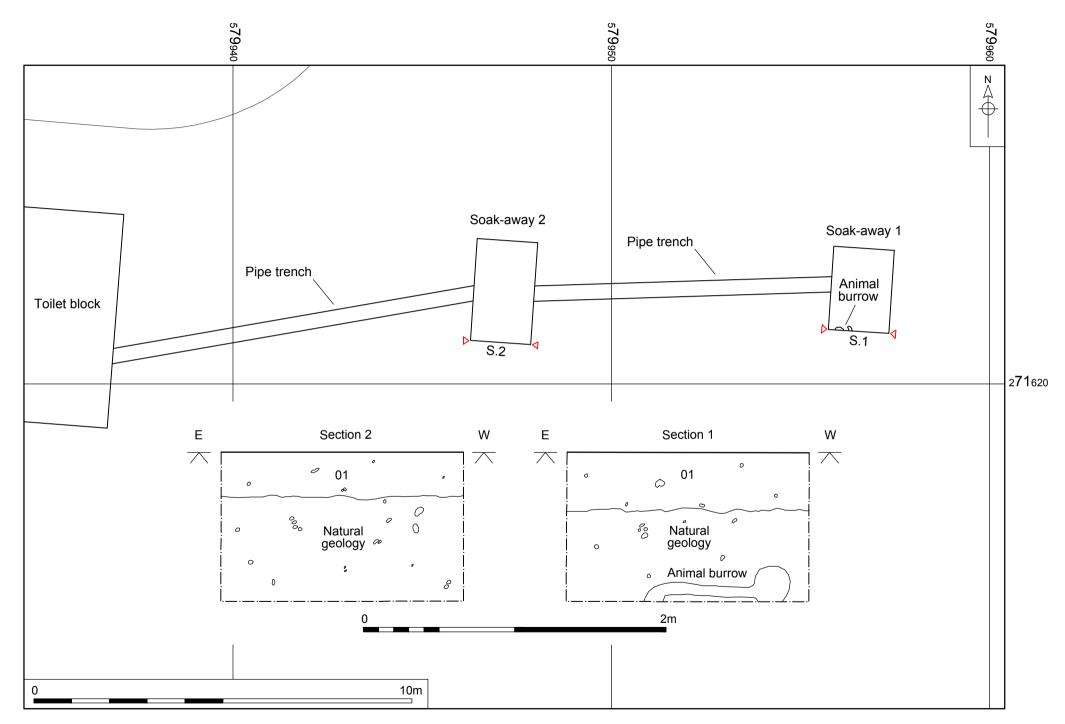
Plan showing pipe trench and soak-aways 1 and 2, with sections 1 and 2. Scale 1:100 and 1:25
